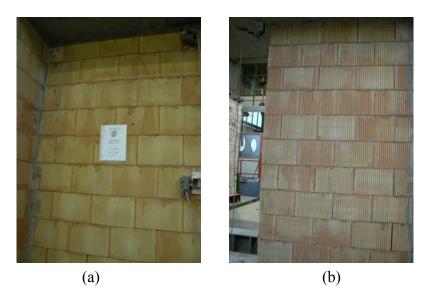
Specimen B3: Test 0.18g: Cracking through the height of 1st horizontal wall the crack appeared perpendicular to the holes of clay units (a) front view, (b) back view.
